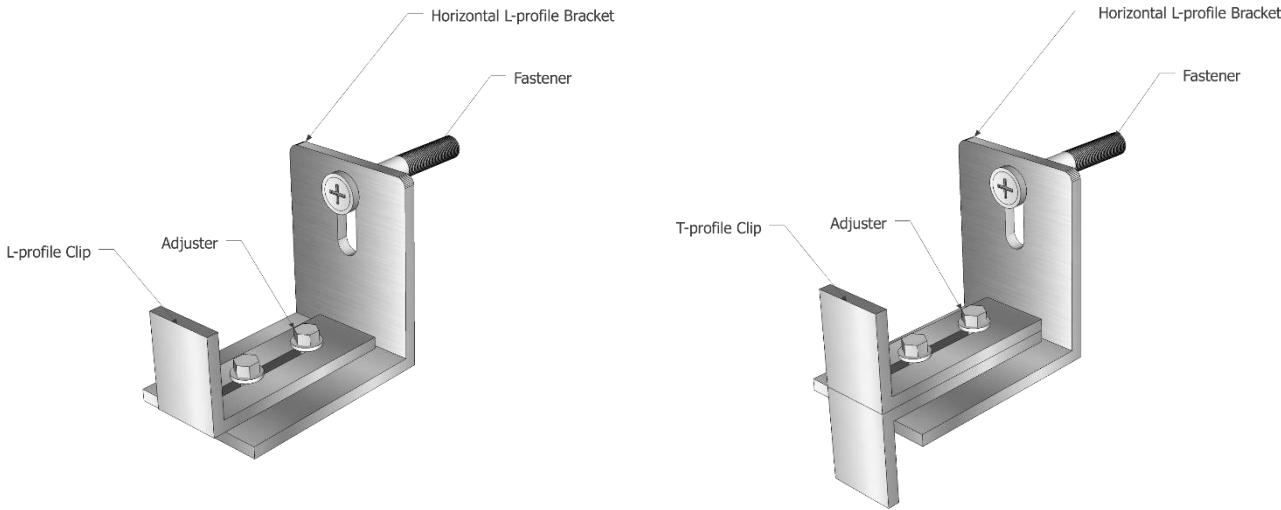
ILLUSTRATION OF A WALPANEL WALLSHELL® LT ANCHORING SYSTEM
